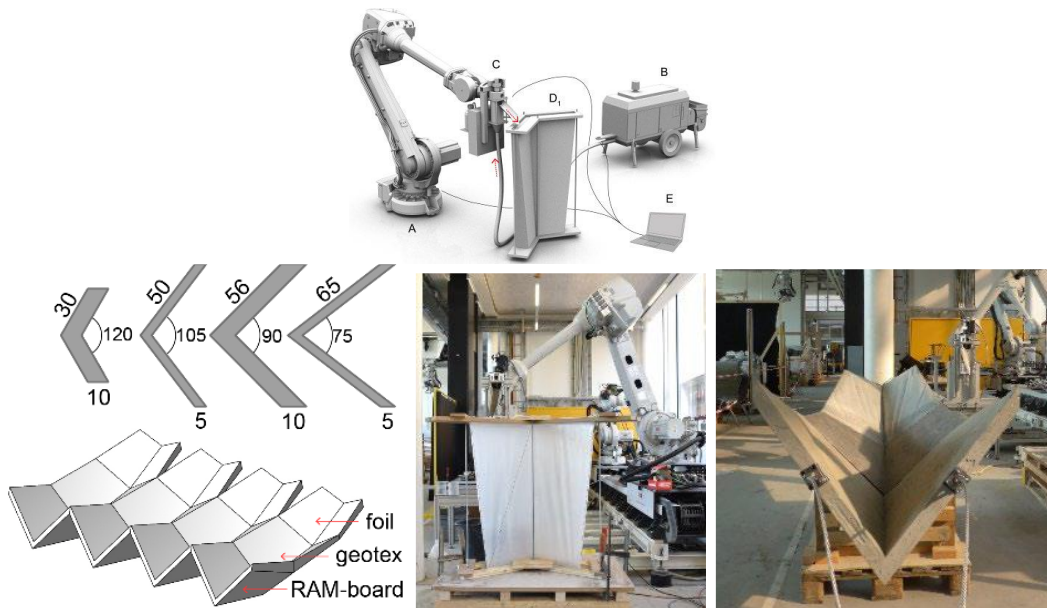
Diagram of a foil-based robotic concrete casting setup and lab demonstration of roof section with a changing cross-section
